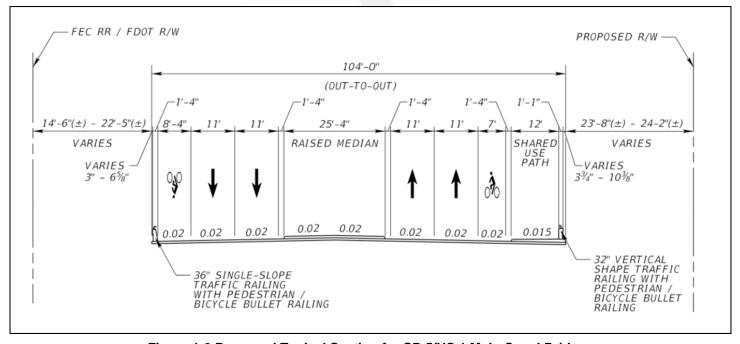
Proposed Typical Section for SR 5/US 1 Main Canal Bridge
